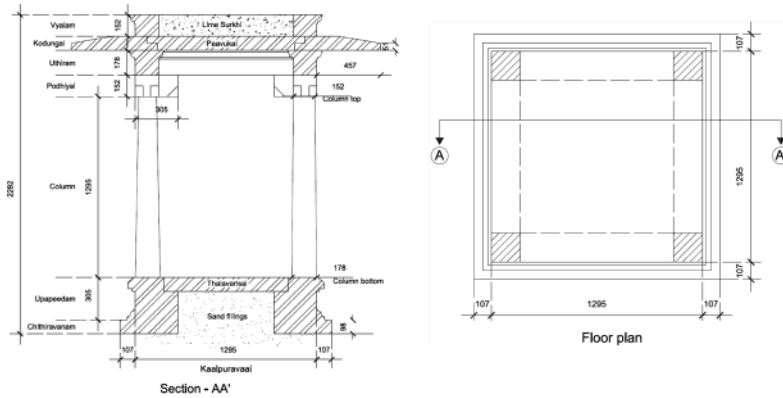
Cross-sectional elevation and plan of the full-scale model of the four-pillared mandapa.
